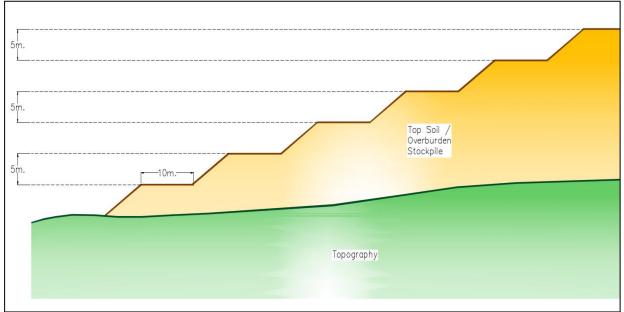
shows the design parameters for the topsoil / waste overburden stockpile.
